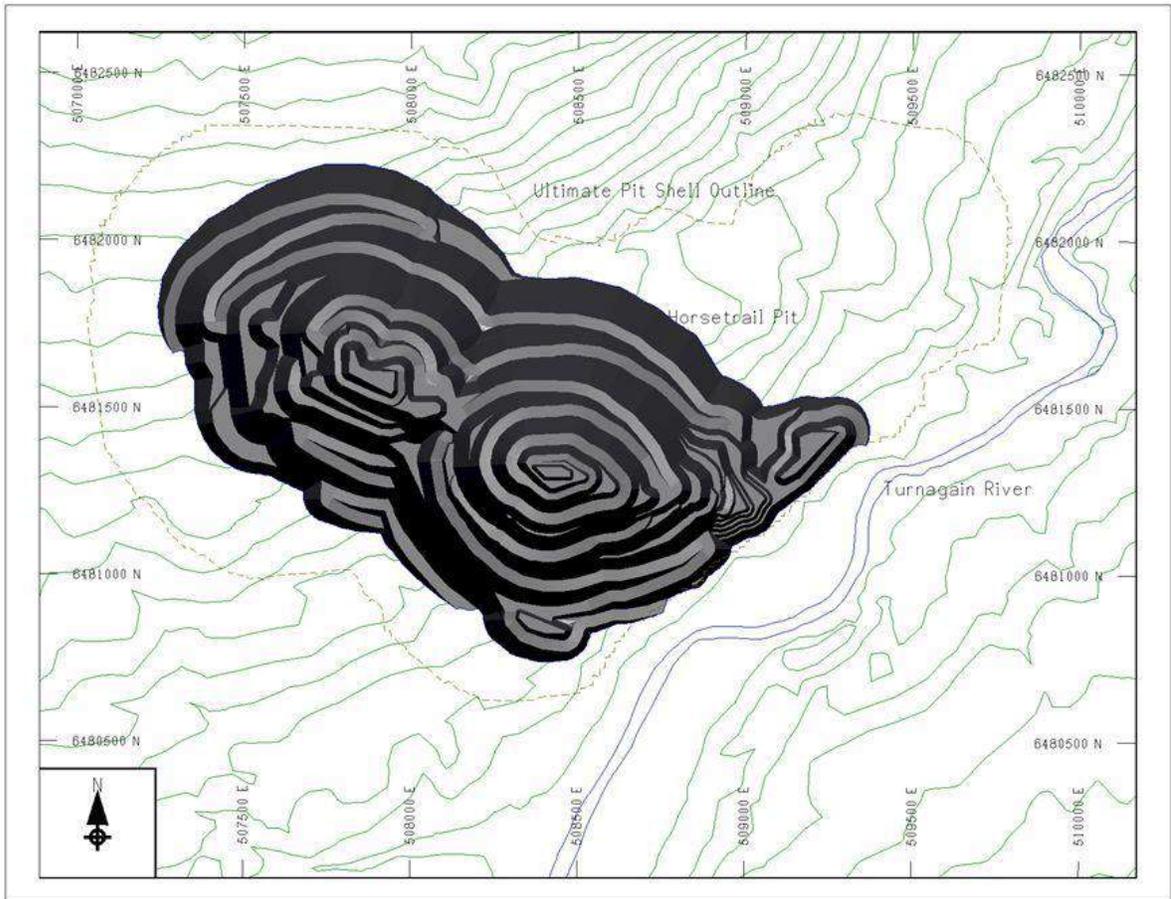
Plan View of Optimized Pit (Ultimate Pit Shell)
